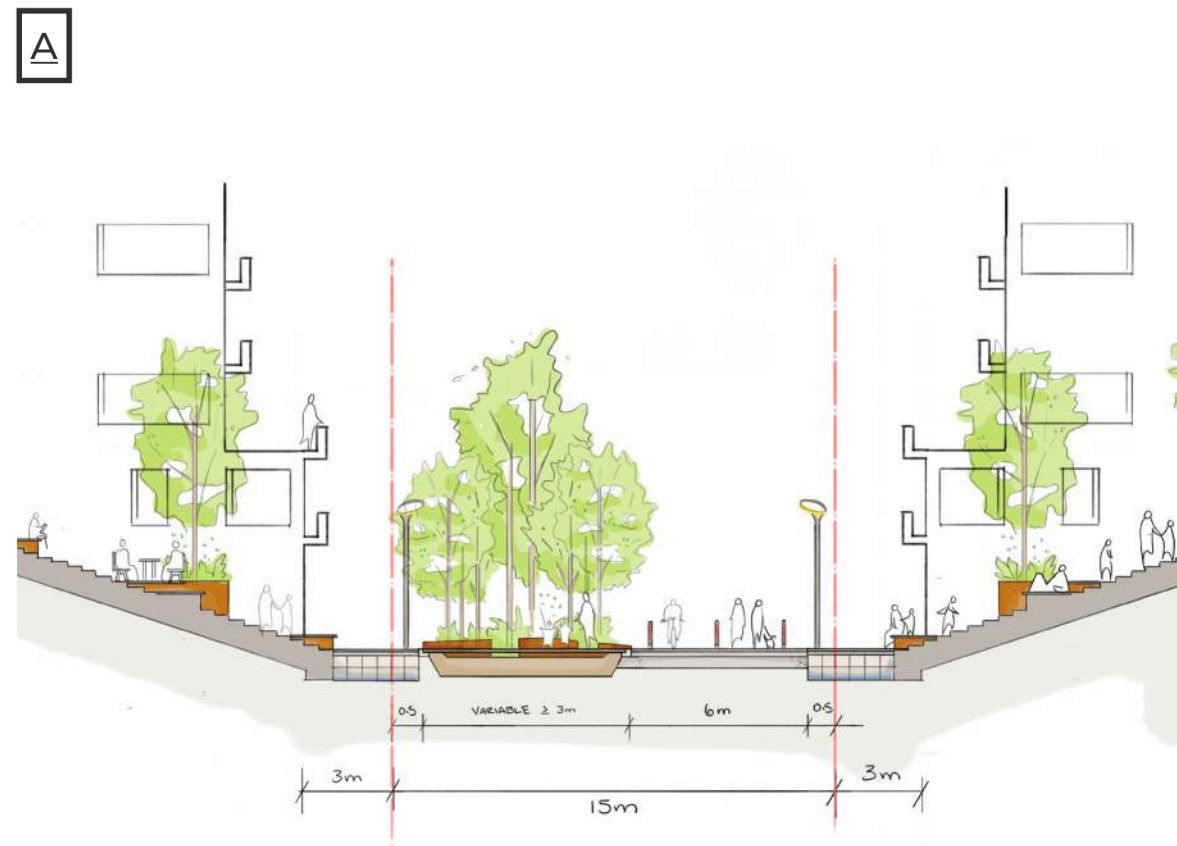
Typical cross section of the Selkirk Spillway at Semi-Public Courtyard Access
